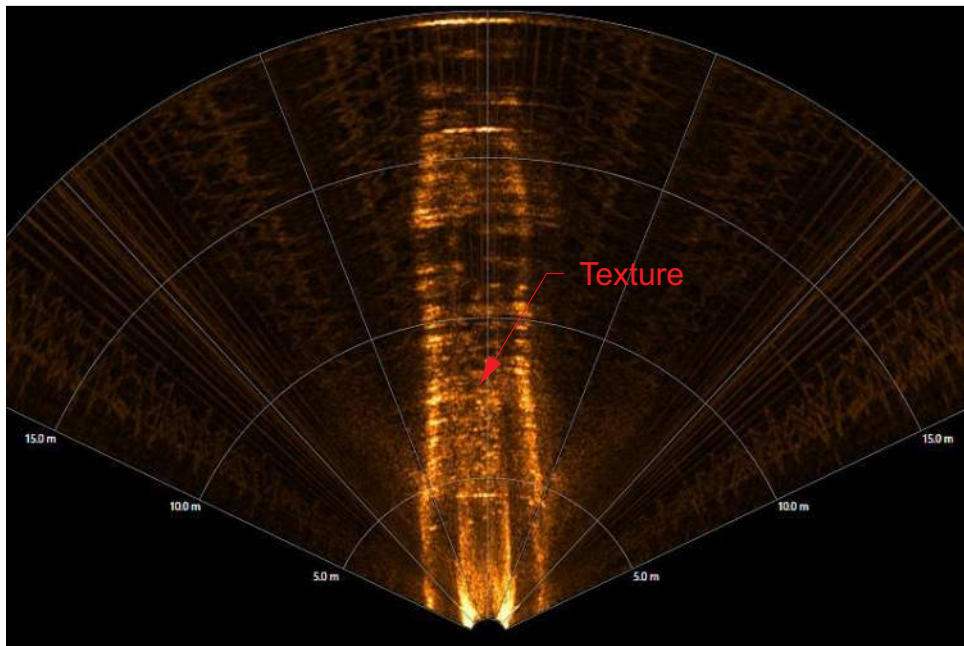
B-2: Sonar image at 121 feet downstream of Manhole 3. Texture on invert approaching outlet.
